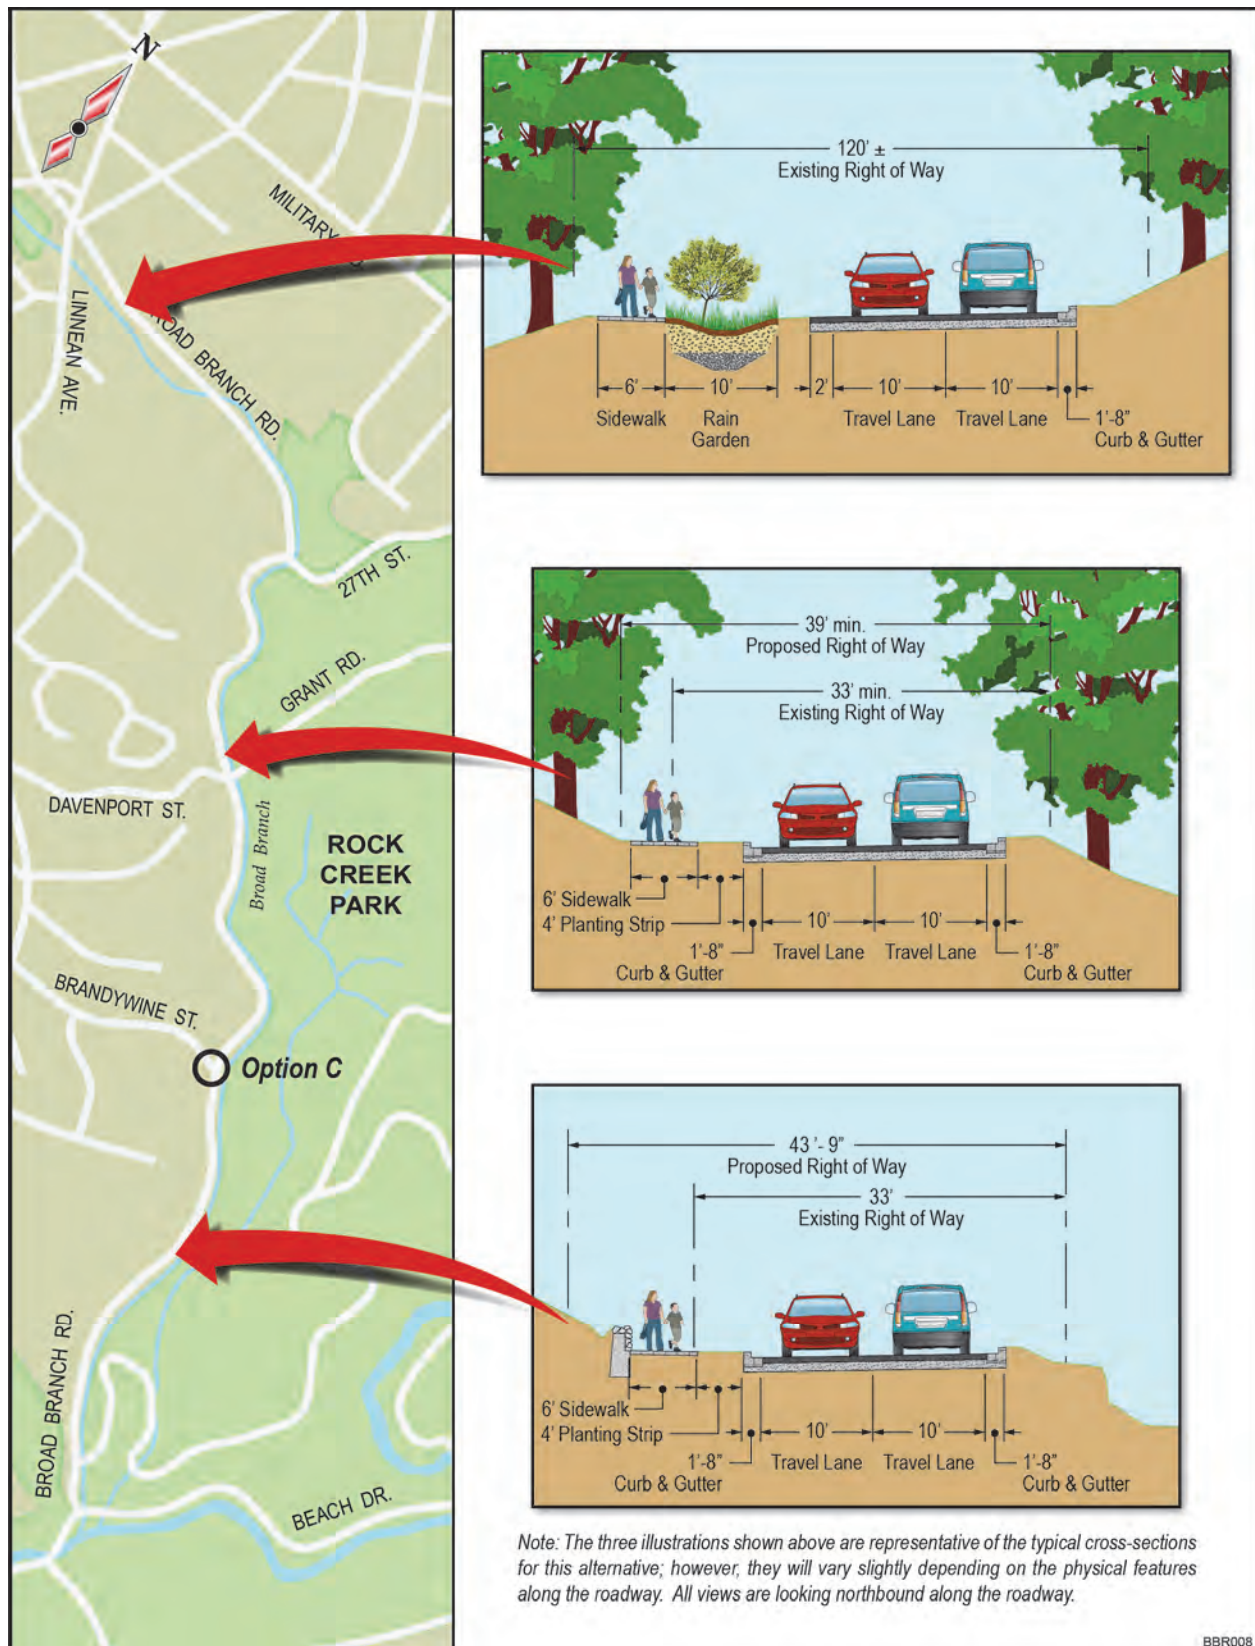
Candidate Build Alternative 3 – Typical Sections
